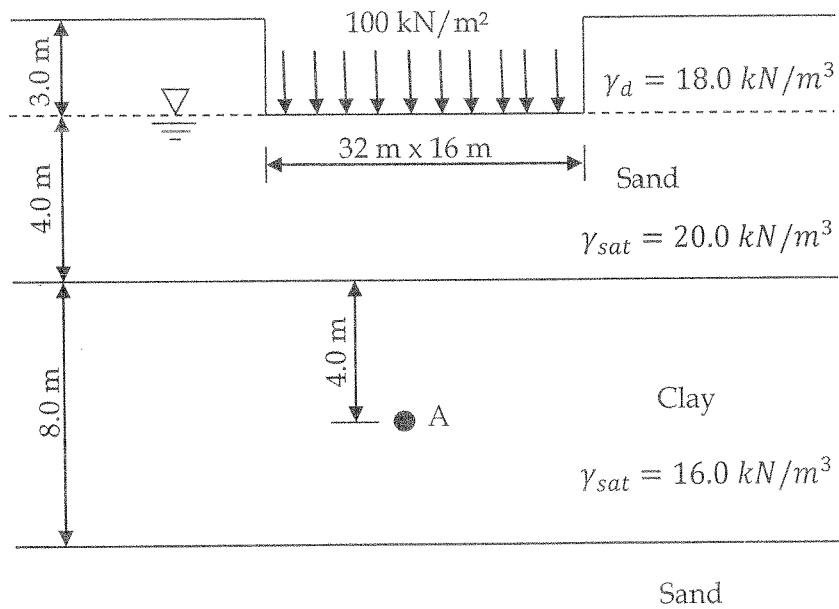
Subsurface soil profile and foundation arrangement
